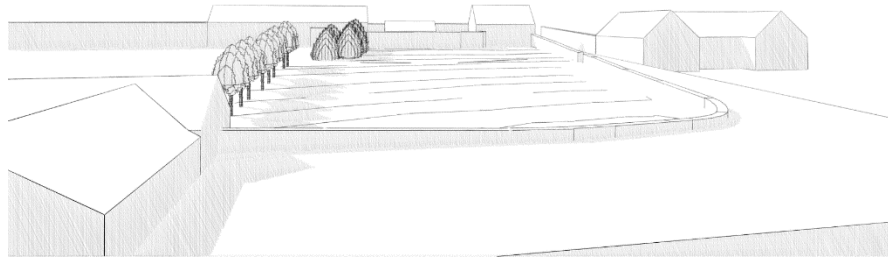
Existing view of proposed site looking South, trees and hedgerows omitted for clarity
